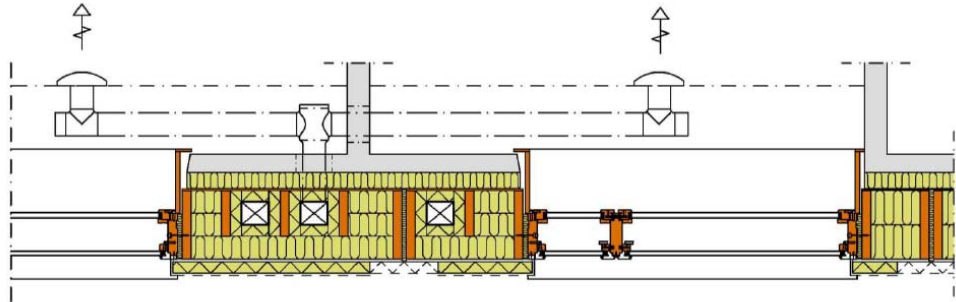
Horizontal section through the façade shows the vertical ventilation ducts and the inlet of one apartment with a fork supply for two rooms [Lylykangas Architects].
